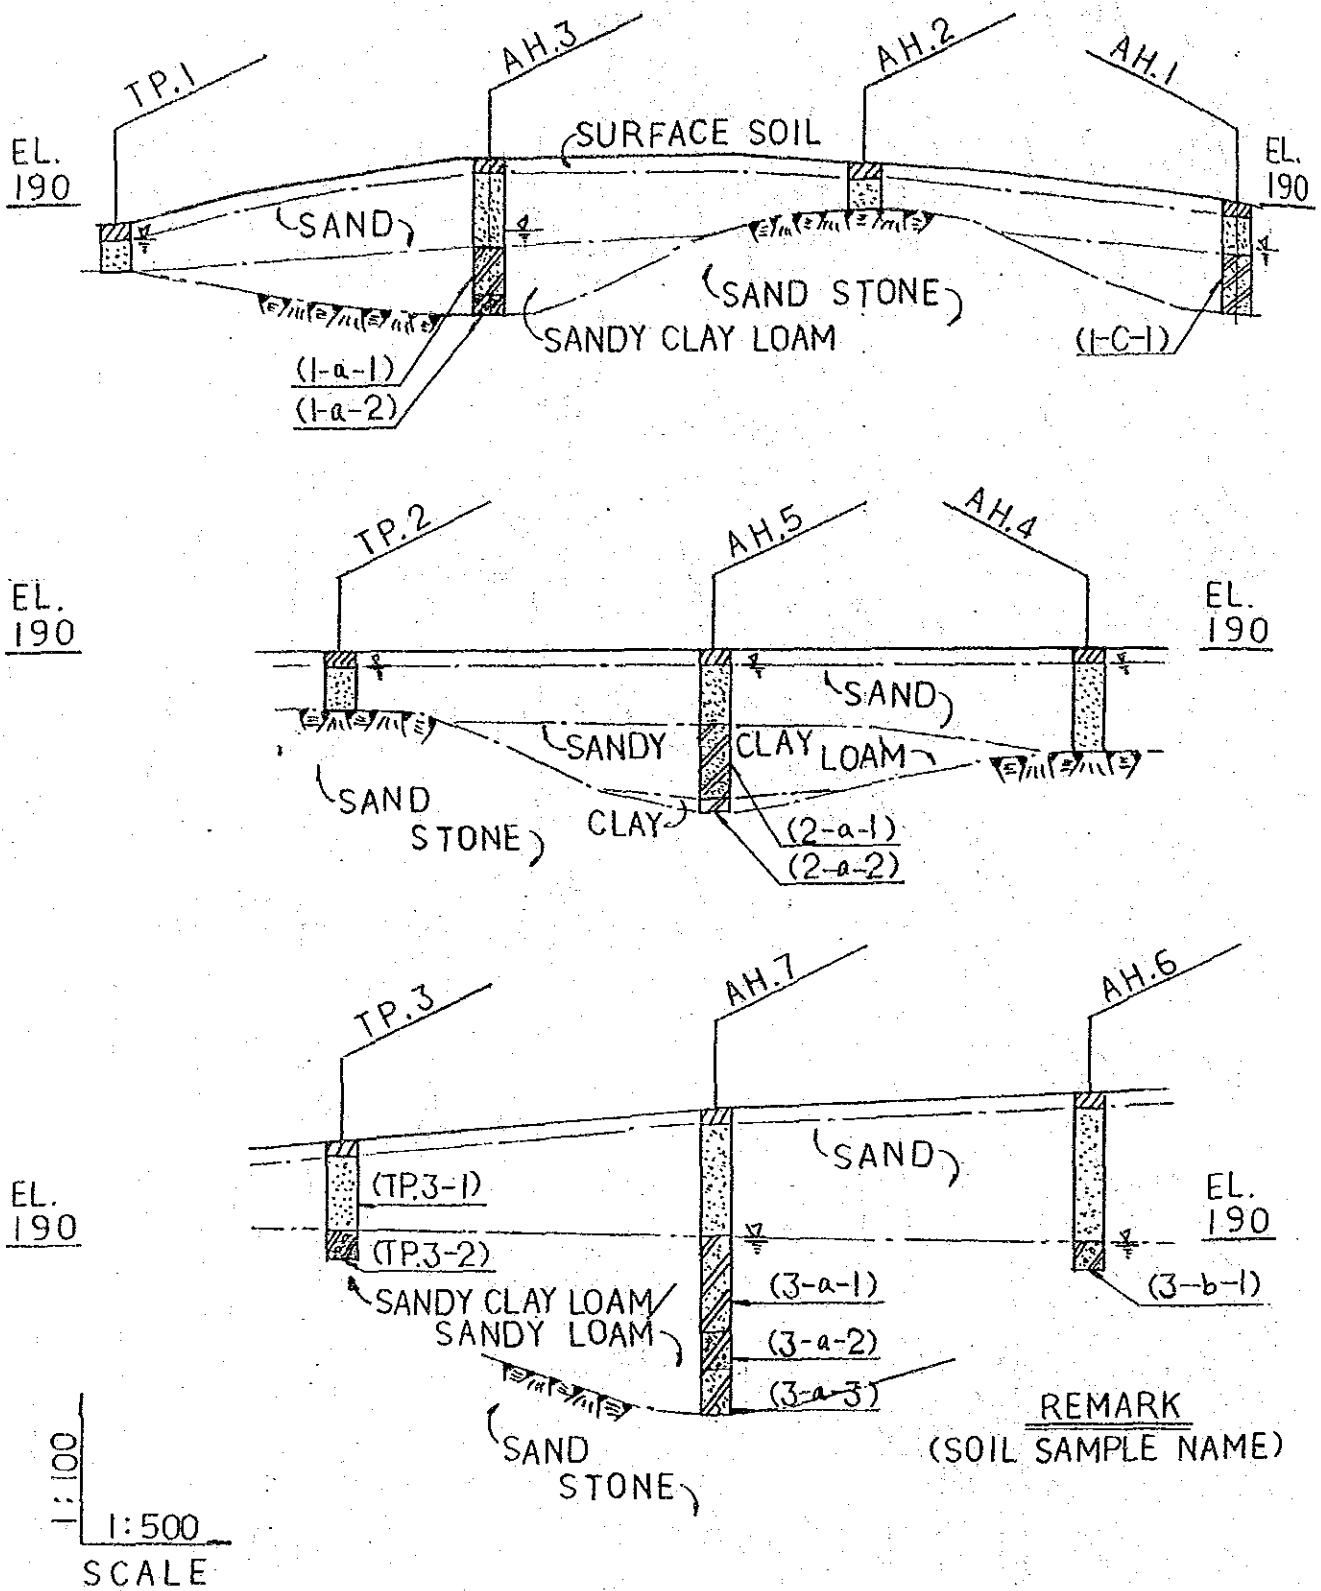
GROUND CONDITION AT RESERVOIR SITE
